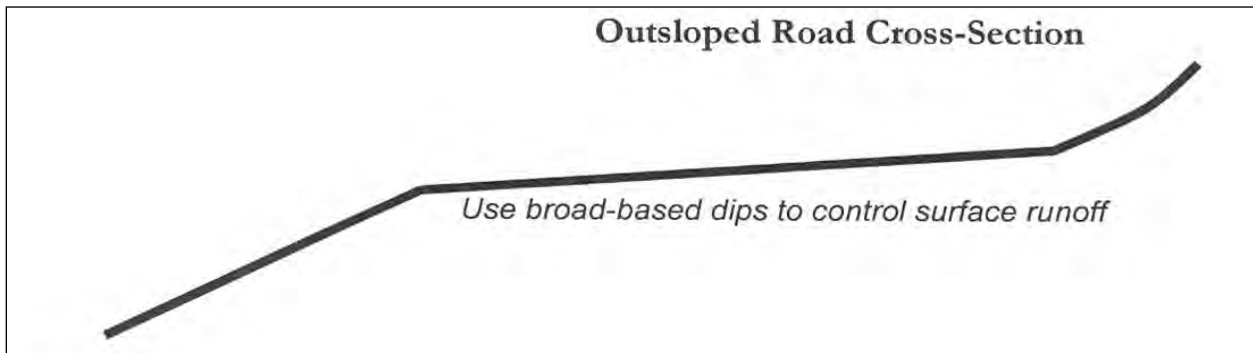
L: Schematic cross-sectional sketch of outsloped road surface profile
